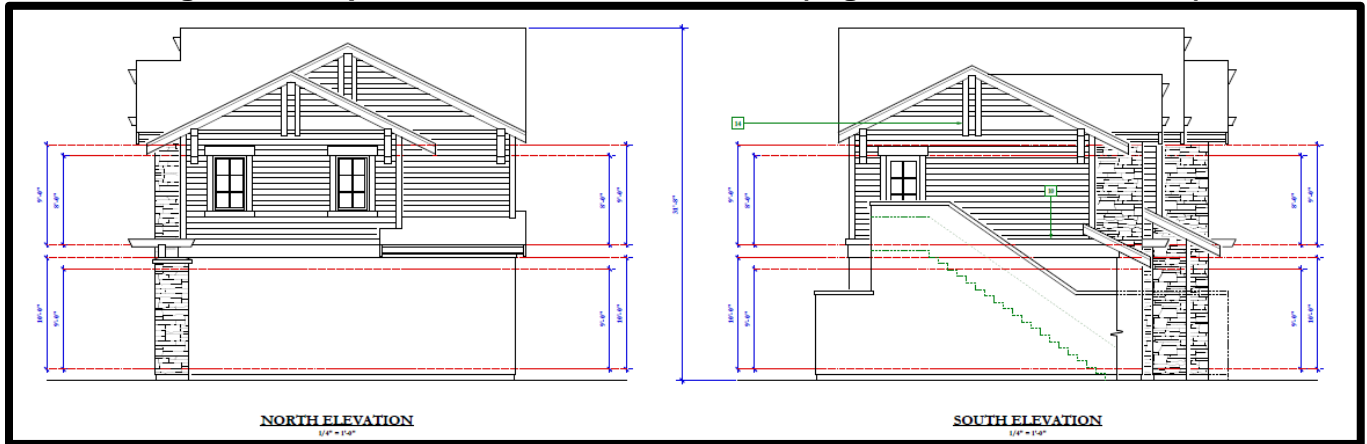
Proposed Residential Elevations (Right and Left Elevations)
